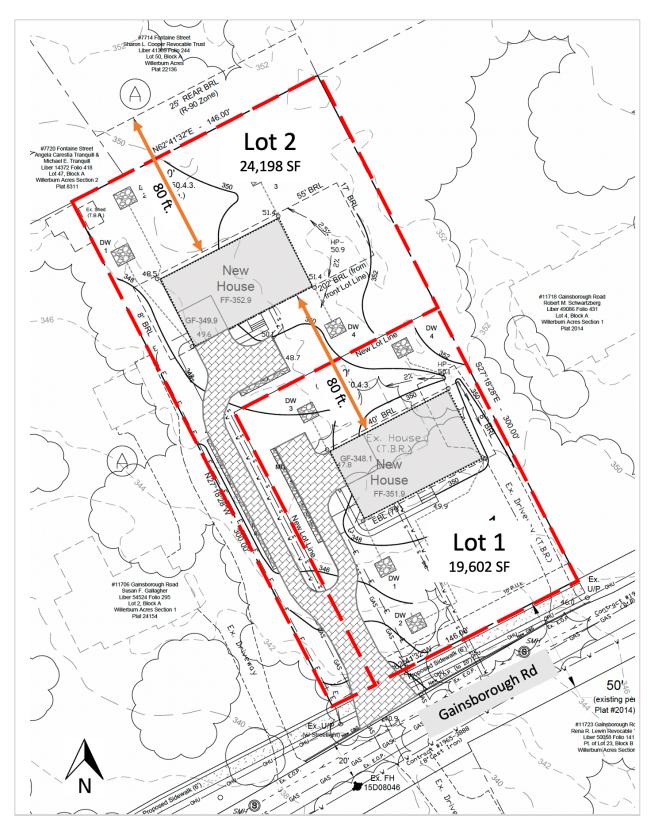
Proposed Administrative Subdivision Plan No. 620230040
